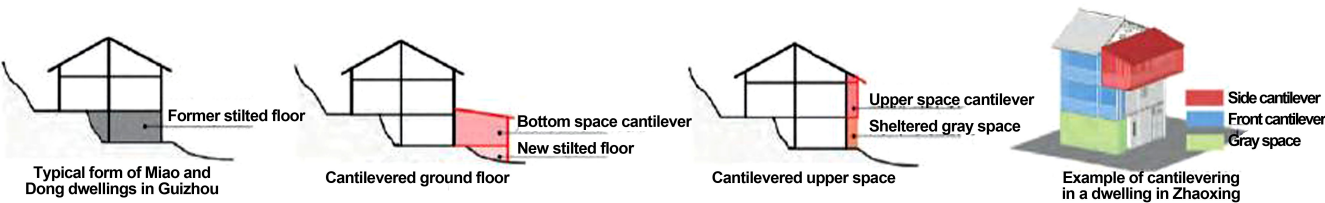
Cantilevered spatial extensions in Miao and Dong dwellings in Southeastern Guizhou
